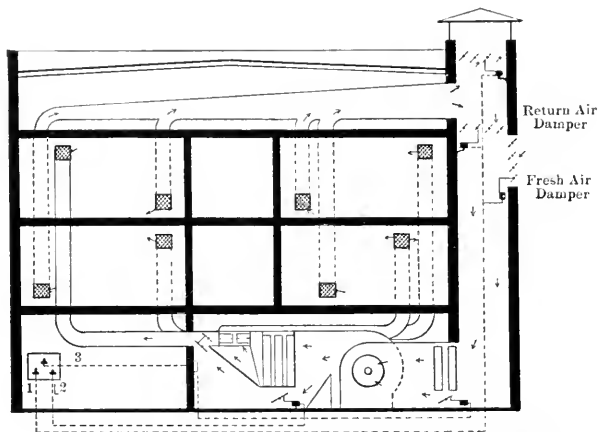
JOHNSON REMOTE CONTROL SYSTEM FOR DAMPERS.
